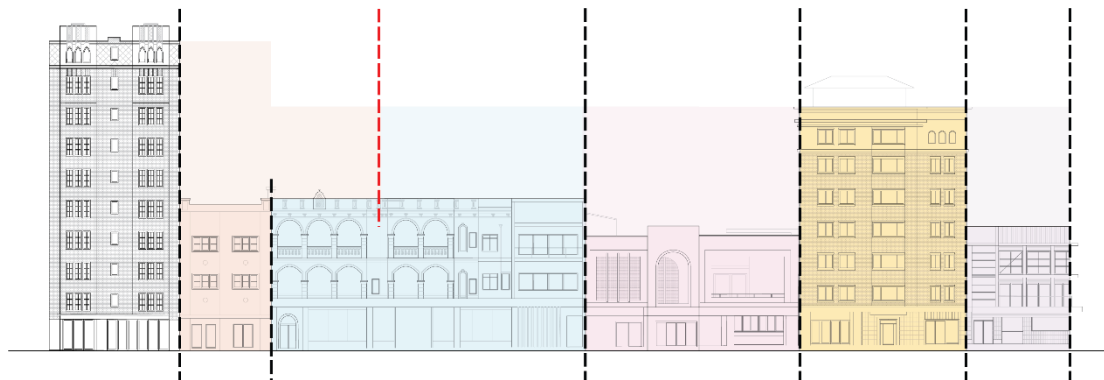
Streetscape massing showing alternative scheme for articulation to building facades. Note: with regard to architectural expression and core arrangement, this scheme shows new development above existing fabric to 20 Darlinghurst Road may relate to 18 Darlinghurst Road
